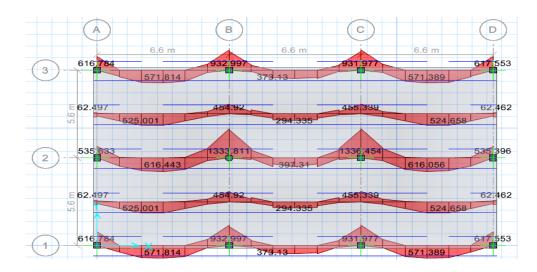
Along longer side reinforcement(SAFE:EC2, without staggered column)
